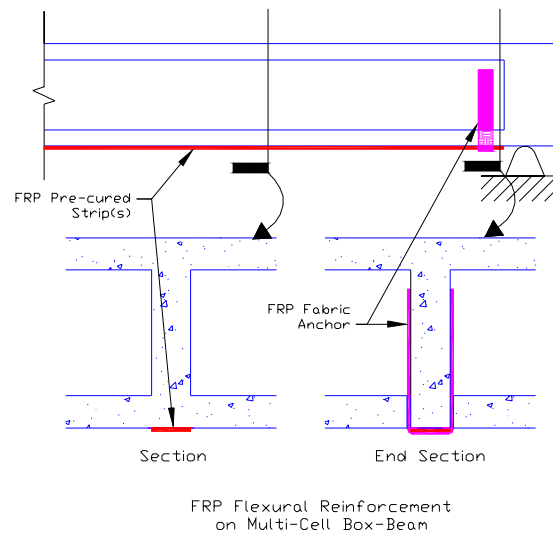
Typical flexural strengthening of multi-cell box girder bridge
